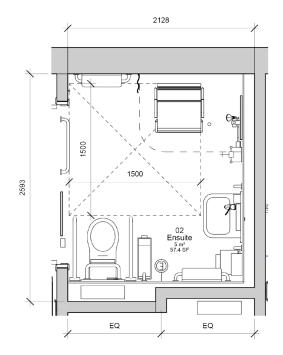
Nested En-Suite, Back-to-Back Arrangement (not to scale)
